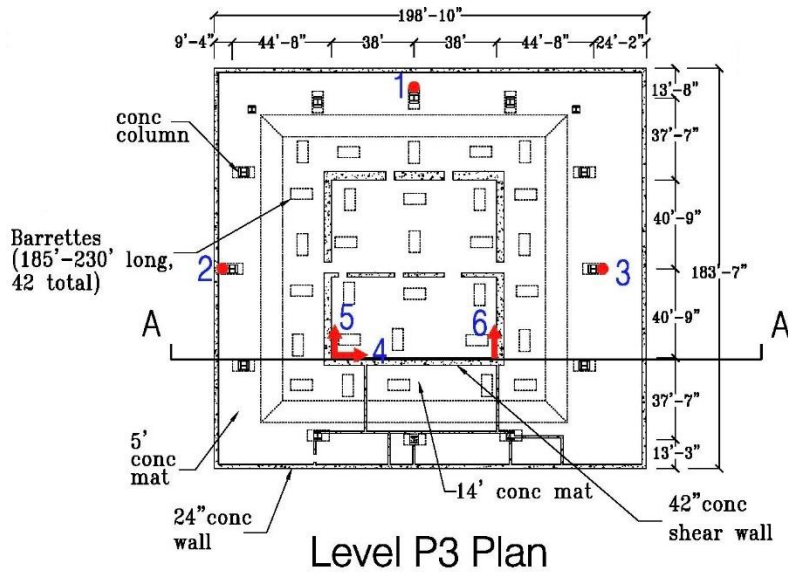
Locations of six sensors at Level P3, base of the Salesforce Tower, which measure translational and rotational motions of the concrete mat foundation.
